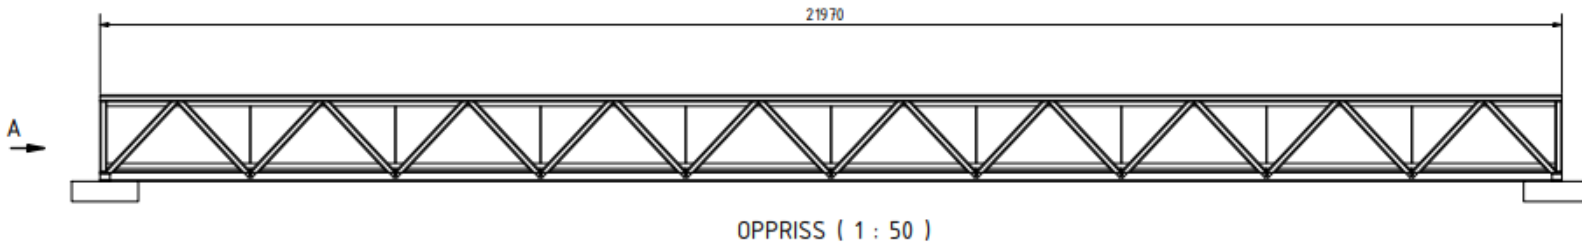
Longitudinal section of the steel bridge with truss configuration.
